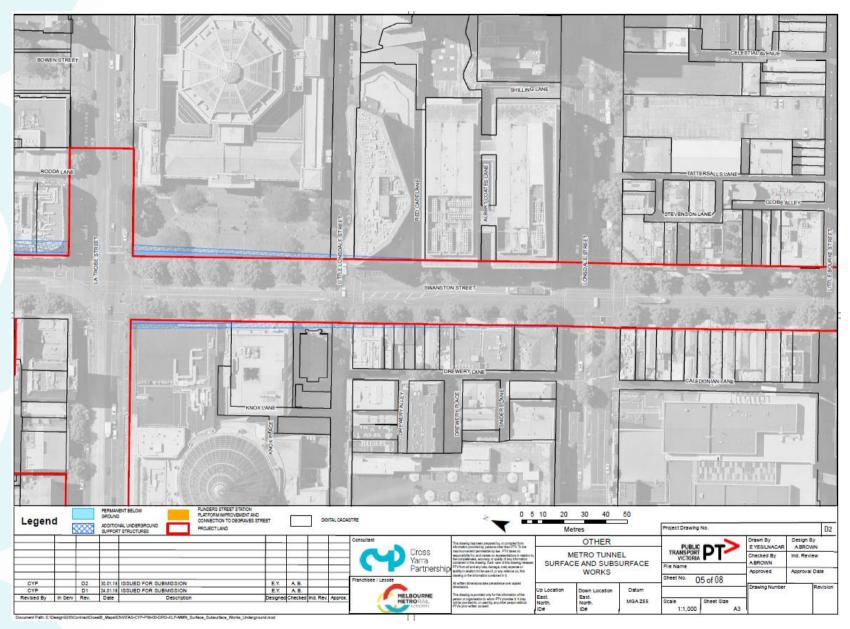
ADDITIONAL PROJECT LAND REQUIRED FOR UNDERGROUND SUPPORT STRUCTURES AND TUNNEL ALIGNMENT AT CBD NORTH STATION
